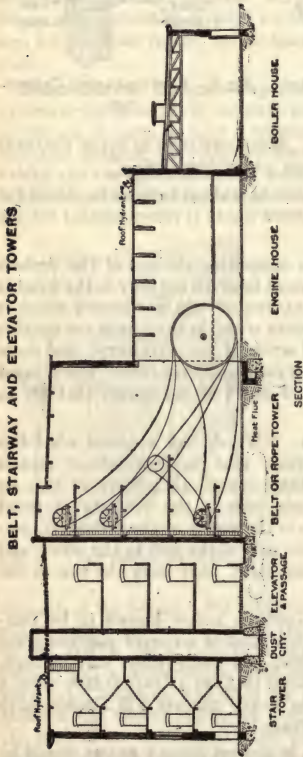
Section through Tower for Elevators, Stairs and Belts
